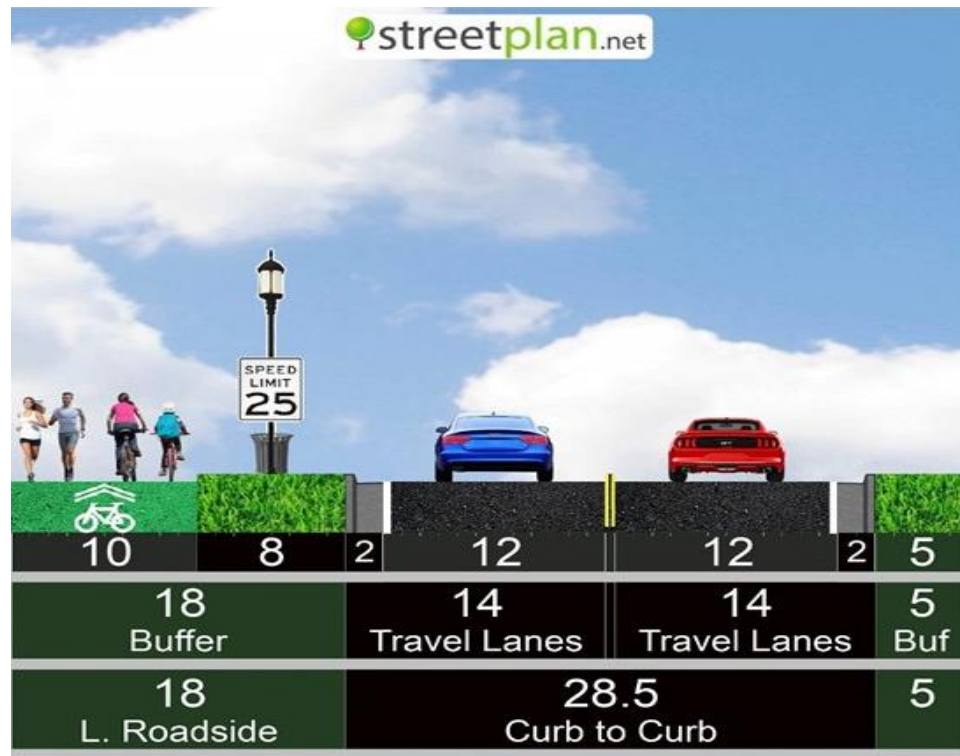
Conceptual Multimodal Improvements (Railroad Street and Rail Trail) from the SVC North to Route 44)
